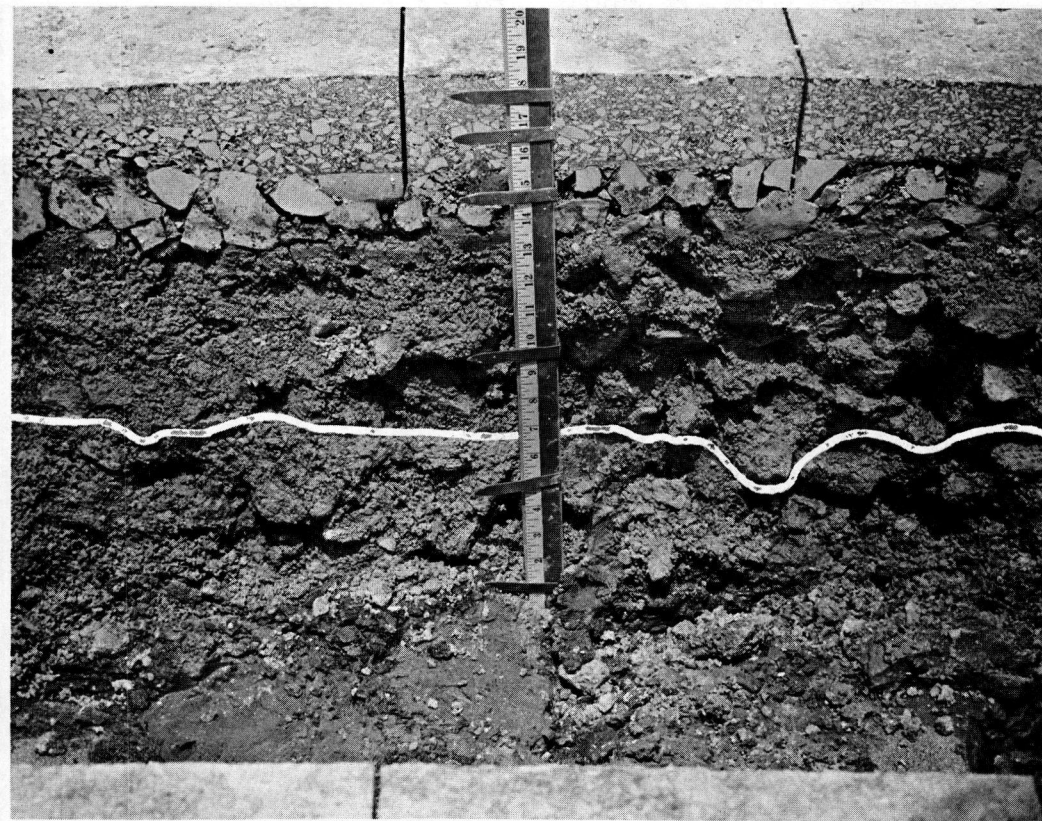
Exposed cross-section of a rutted pavement. Markers indicate the thickness of pavement layers. Demarcation line shows the height to which subgrade soil had intruded into the WBM base.
